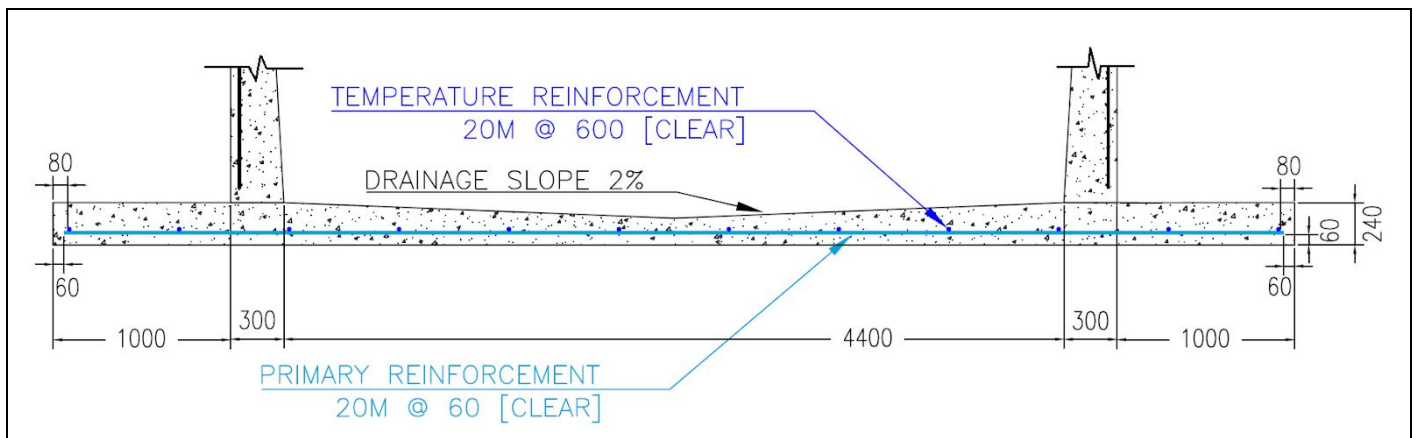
Underpass Detail - Floor Slab Cross-Section (North-South)
